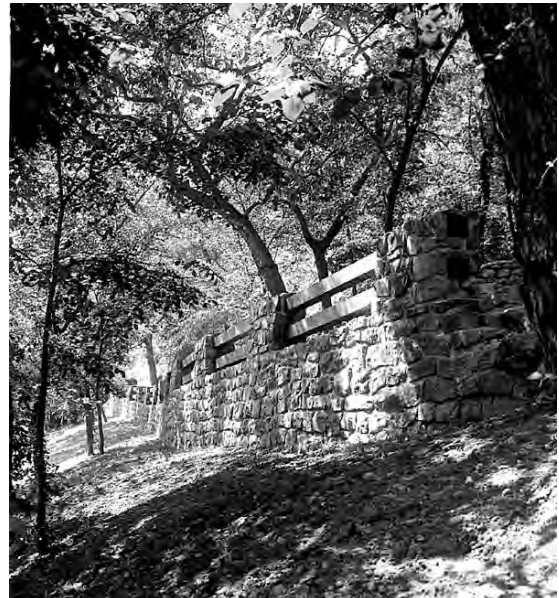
Completed Bromide wall, 1932. Note square timber railings, no longer extant.
